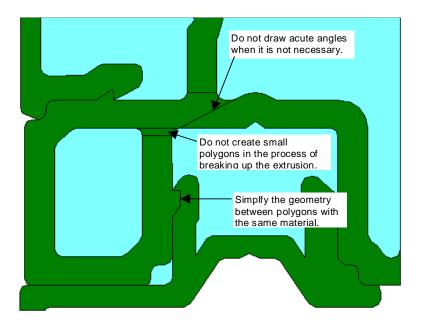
This cross section illustrates drawing mistakes when breaking up an extrusion.
